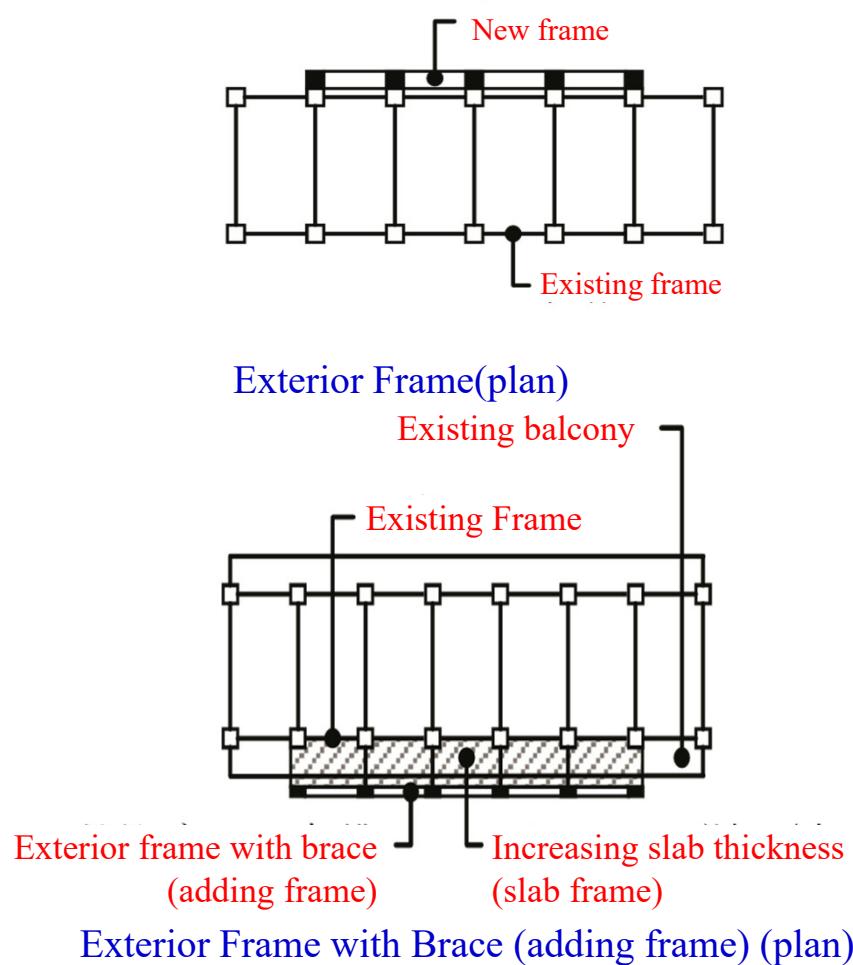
Exterior Frame and Exterior Frame with Brace (adding frame) (reference 2)
